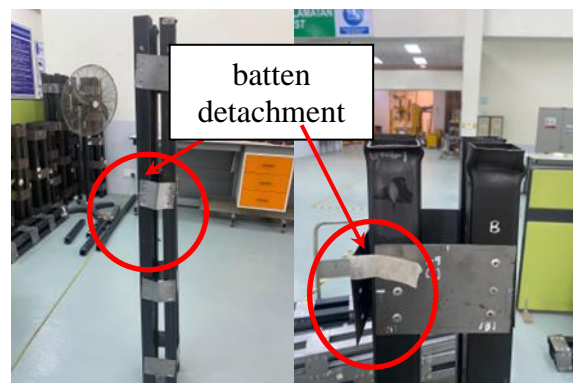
Failure modes for specimen CFS built-up batted column with SHS of S3-H2-B400
